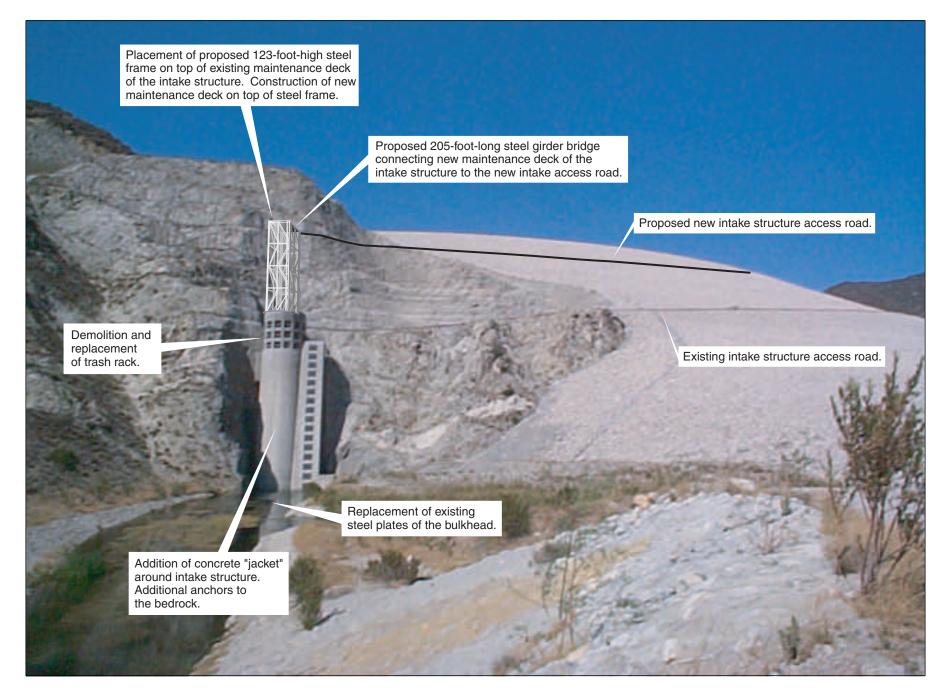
Proposed Project Facilities in Lytle Creek Construction Area
